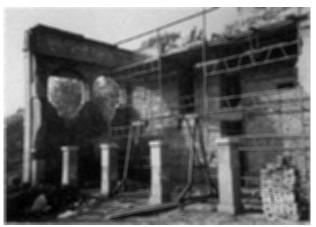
Rebuilding south façade, integrating old stone with new, October 1995. (Author)
